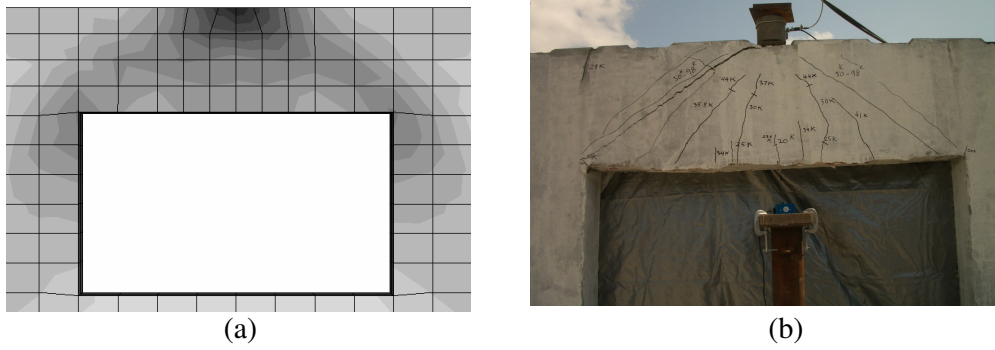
The failure cracks of the panel with window opening by FEM model:
